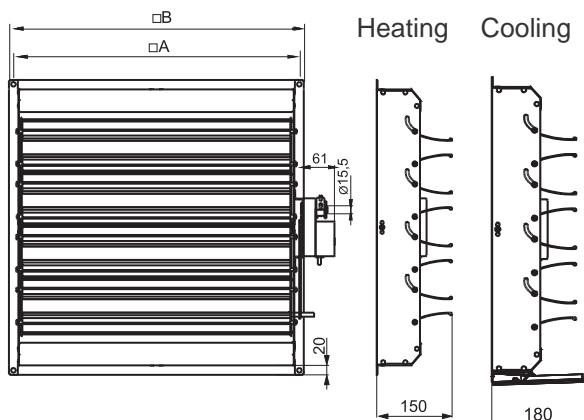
Secondary-air louvre wall – in heating and cooling version
